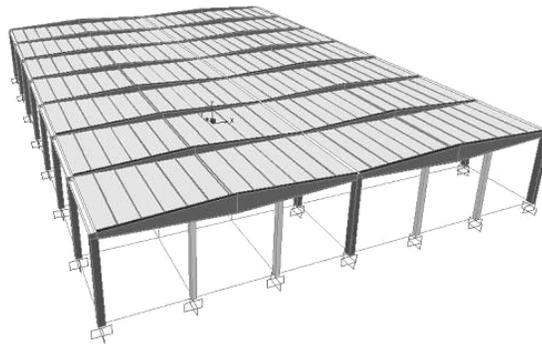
Structural System of Building 1 (Demiralan 2009)
